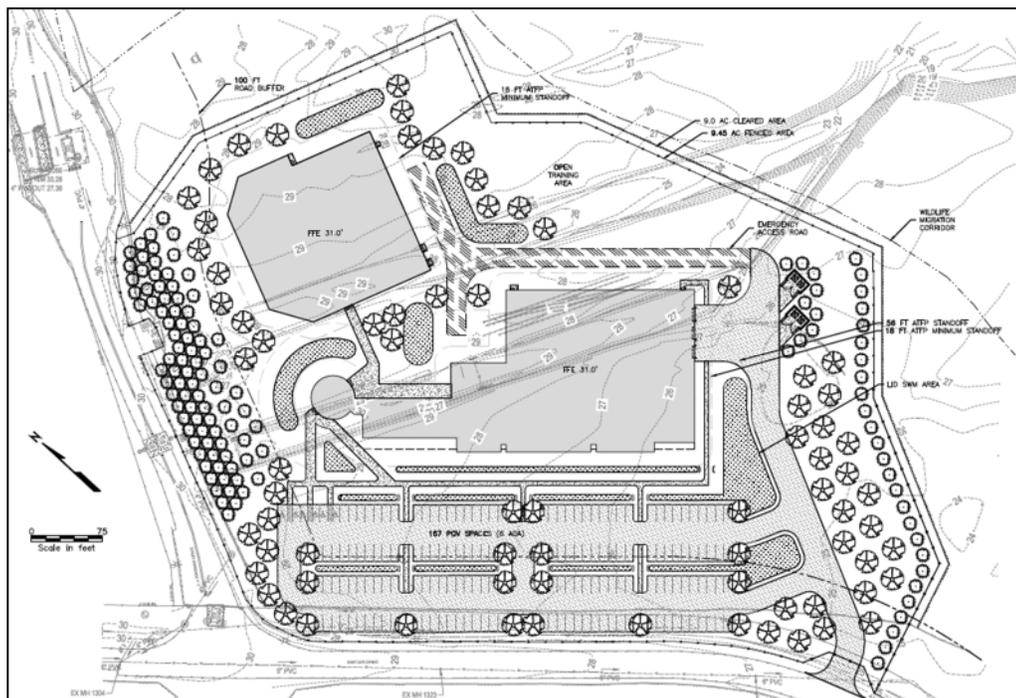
Concept site plan Skills Training Facility at Davison Army Airfield, Fort Belvoir, Virginia.
